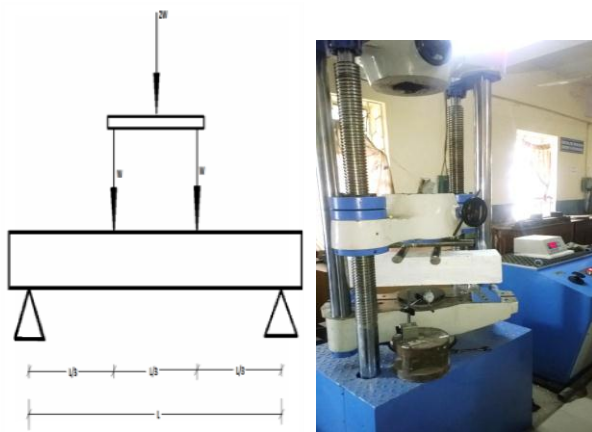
Schematic Beam Testing Set-up (Four Point Loading Set-up)
